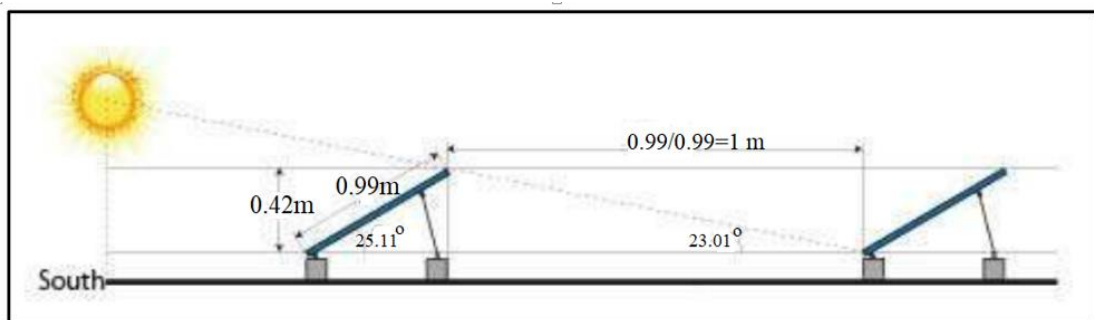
Layout of how the panels are distributed on the roof (Design of Photovoltaic Systems, 2022)
